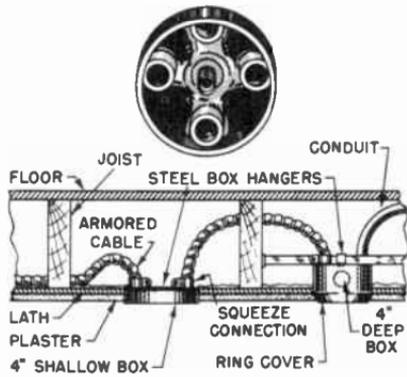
Armored cable can be run from box to box. It can be easily fished through the hollow spaces within the walls and above the ceiling.
